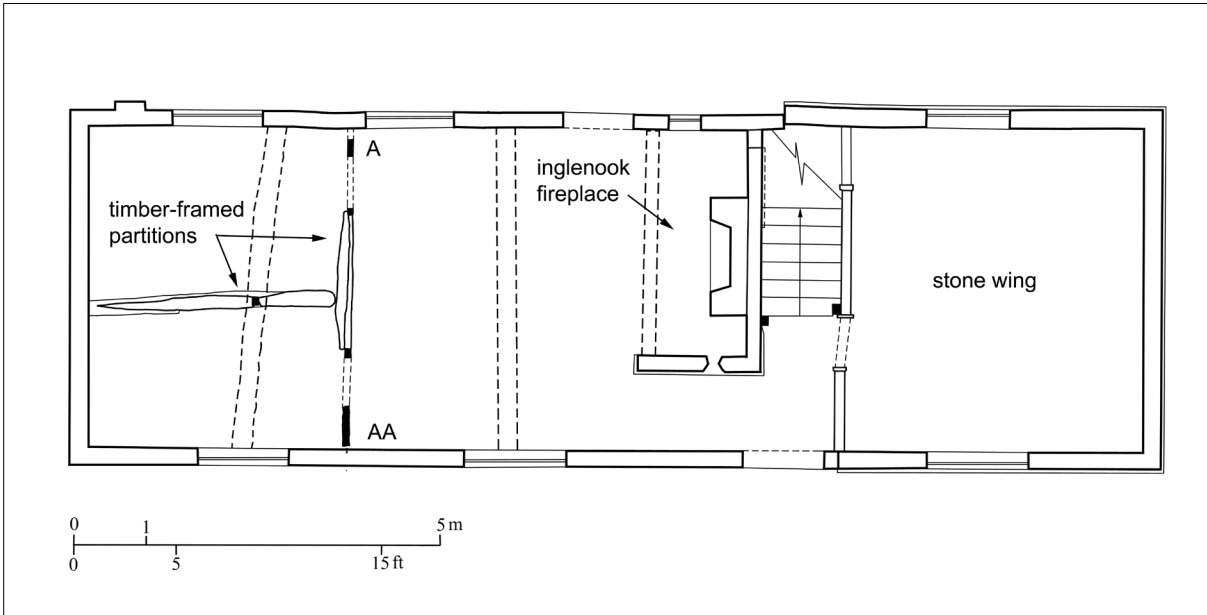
Plan of Onion Farmhouse showing the surviving timber-framing.
